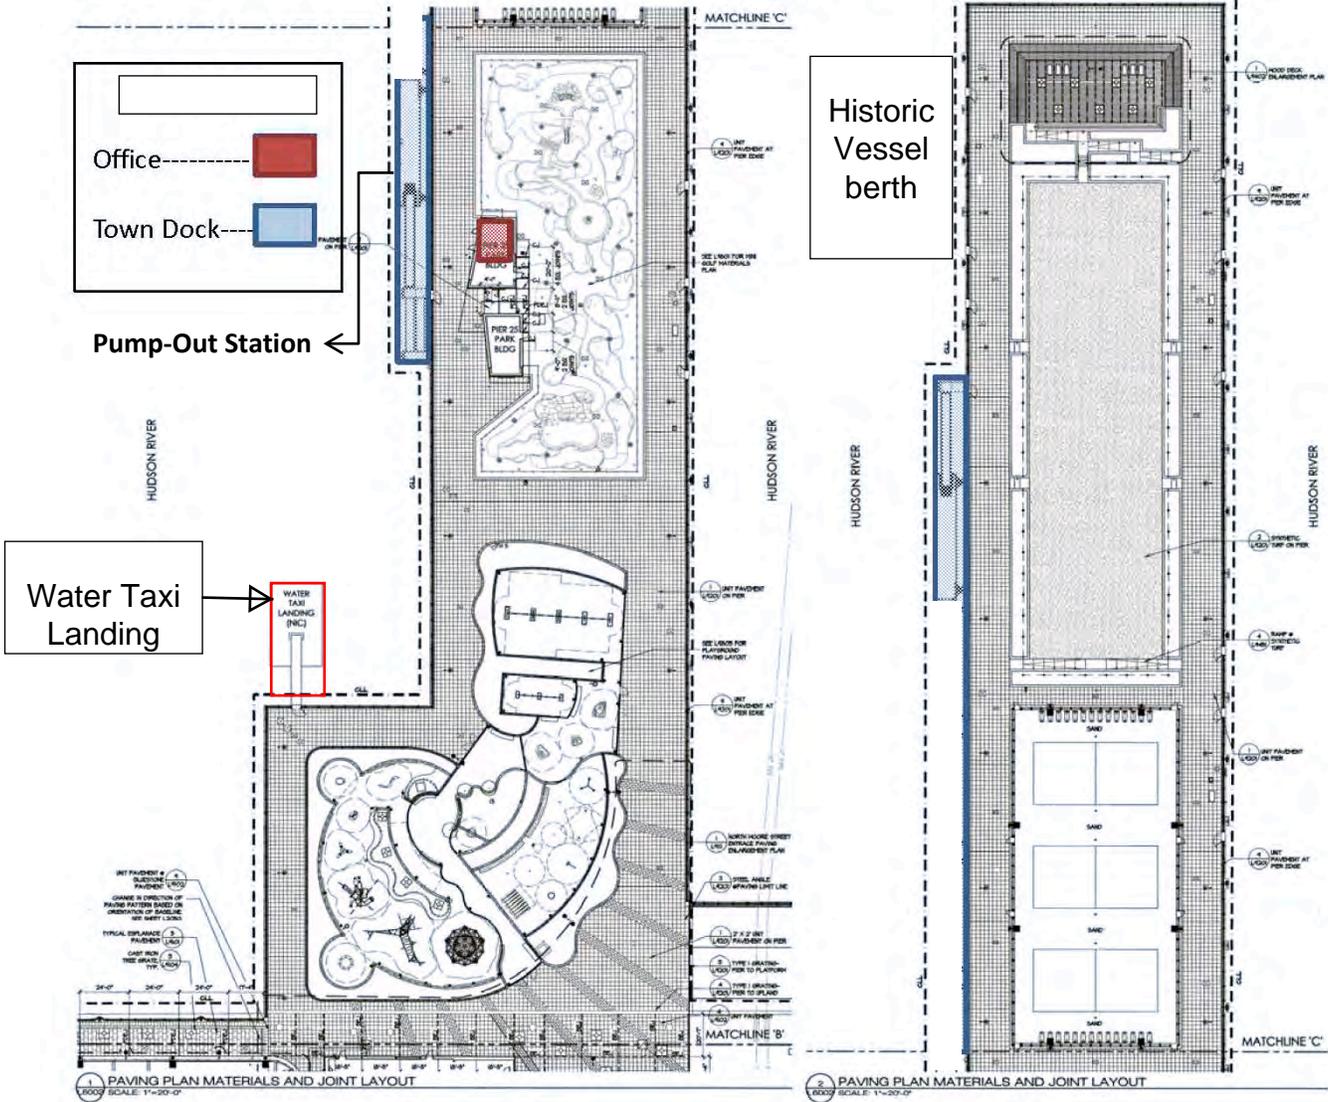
Exhibit A- Premises: Site Plan of Pier 25 Marine Facilities
